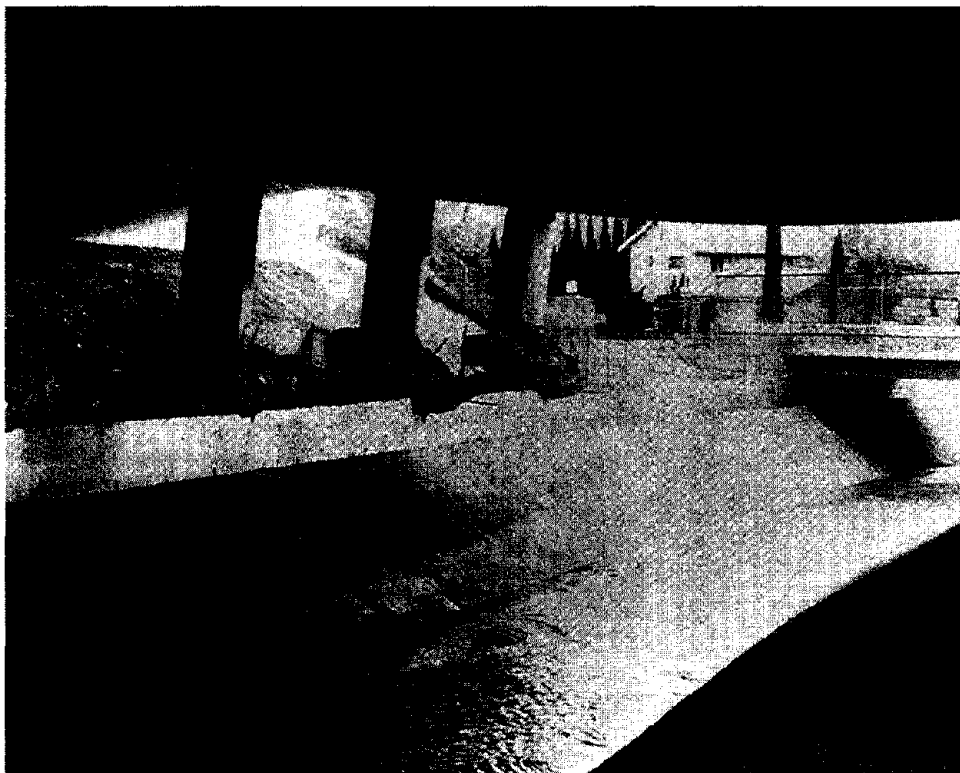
Damage to piers of Bent 3S of State Route 118 at Bull Creek Canyon Channel, looking to the southeast.
